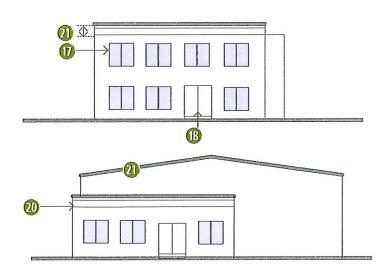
C. Workshop/Warehouse: Height & Uses Requirements
